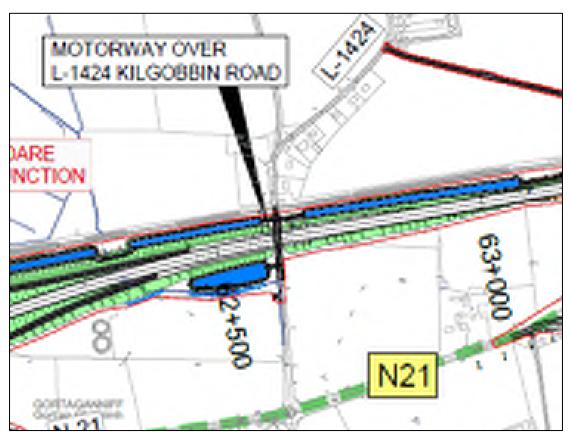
Proposed Bridge over L-1424 Kilgobbin Road (as per the November 2018 Design Update)
